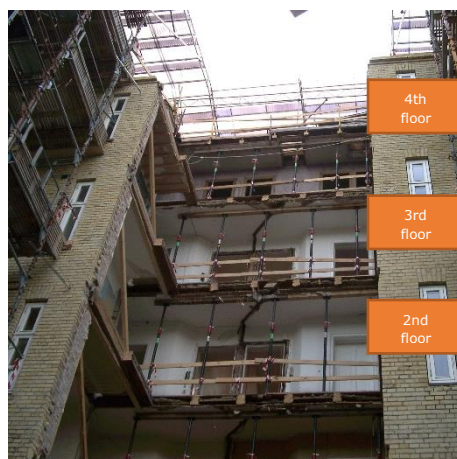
Opening of courtyard facade, photo showing 1st until 4th floor. 4th floor is under the roof.
